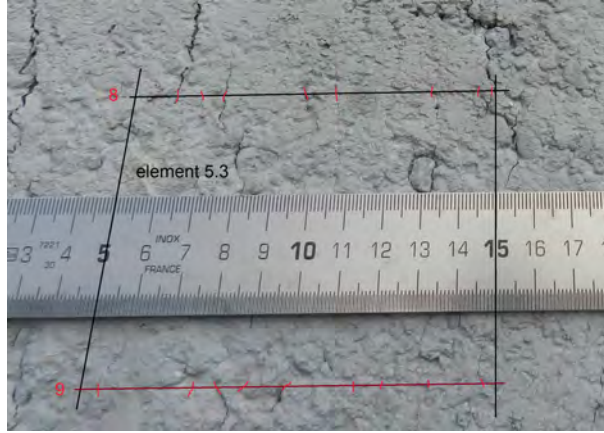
Detail of casting surface of element 5.3 - impression of the size and distance of cracks in the finishing surface; the smallest cracks still visible with the eye or after zooming in on the digital image (crack width estimated at 0.05 to 0.2 mm) are on an average distance of around 11 mm; three medium-sized cracks are visible in the top of the picture (crack width 1 to 2 mm).
